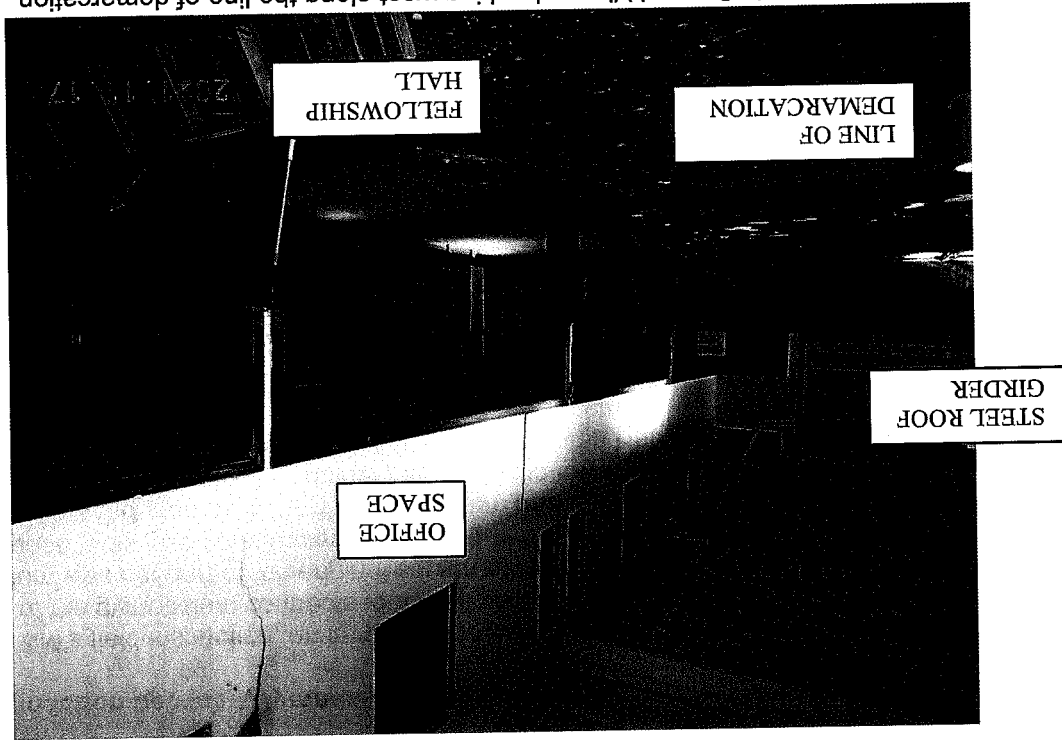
General View – Looking west along the line of demarcation from the gymnasium
